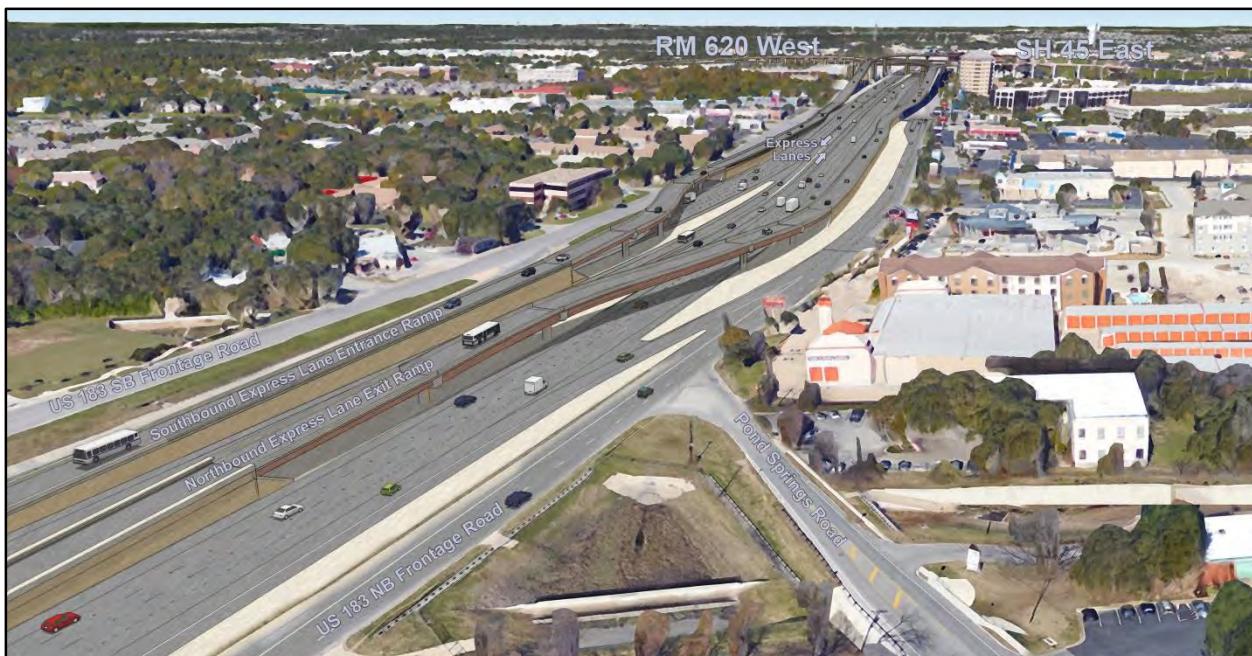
Build Alternative: Artist's rendering (birds-eye view) at US 183 near Pond Springs Road facing north-northwest, showing the proposed elevated Express Lanes.
